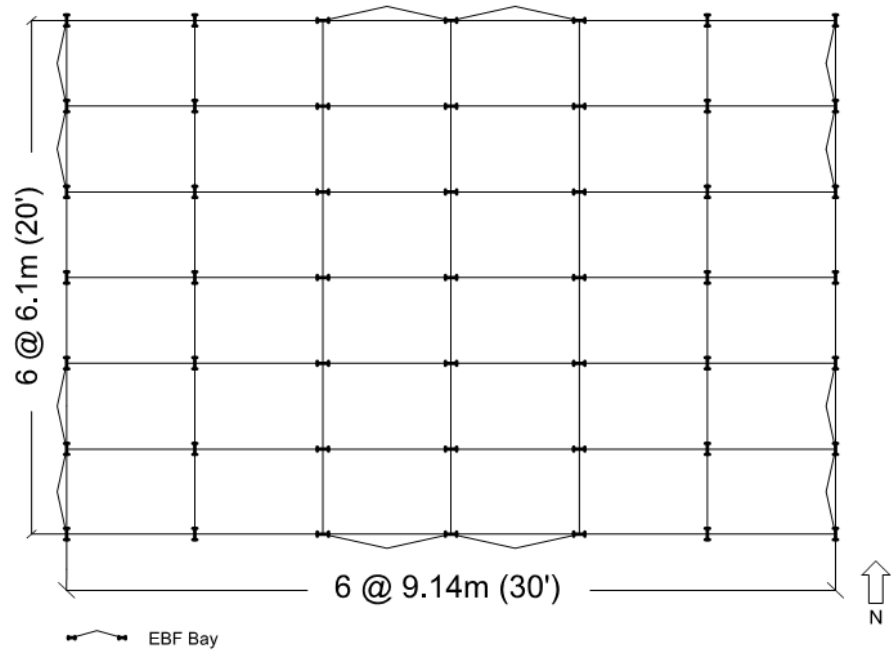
Floor plan of 3-story eccentrically braced frame buildings for SCEBF-Y type
